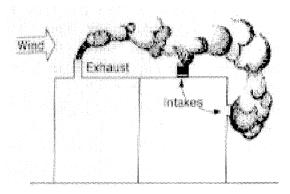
Basic schematic of exhaust reentry via roof and wall air supply intakes (ASHRAE Handbook (Applications) 1999)
